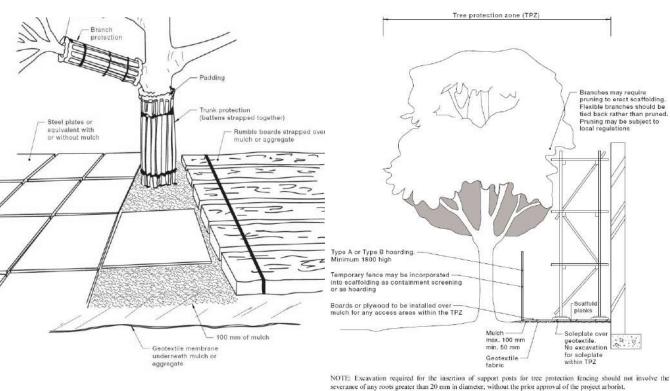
EXAMPLES OF TRUNK, BRANCH AND GROUND PROTECTION
